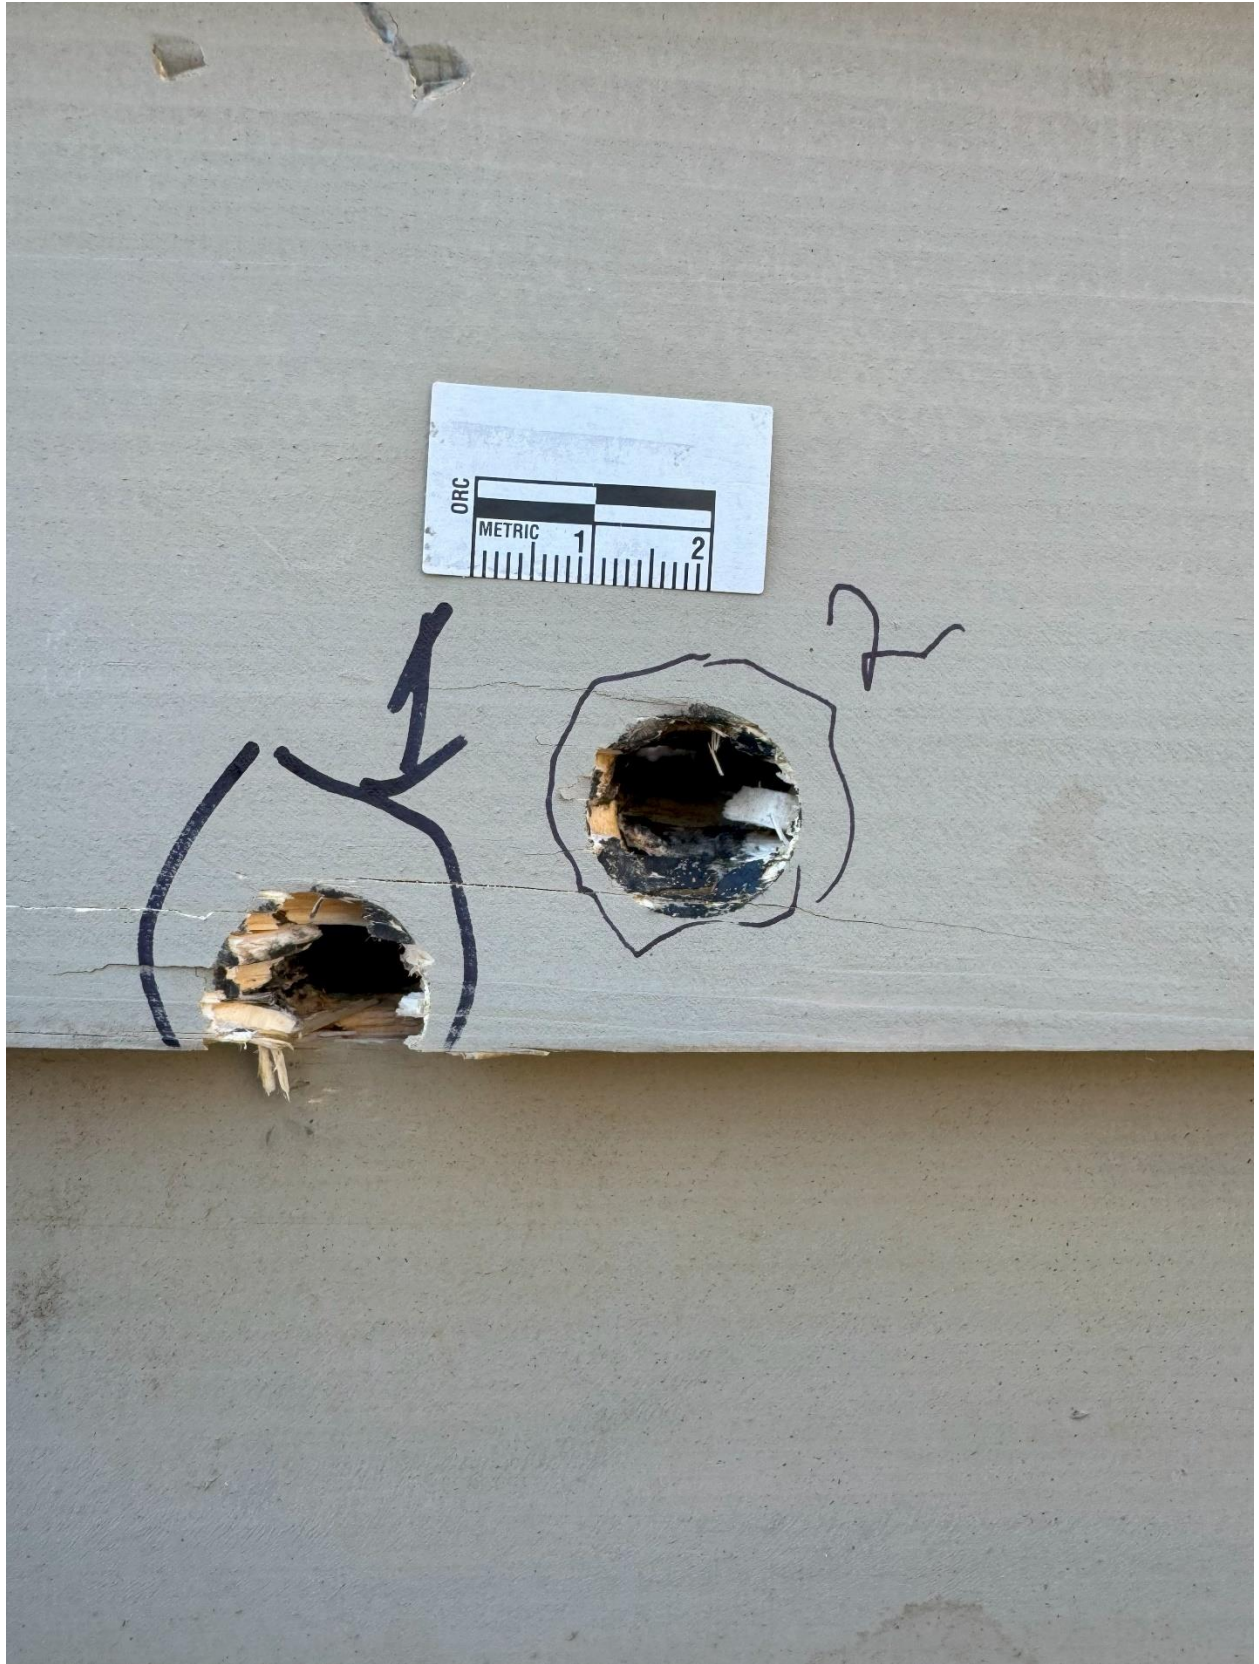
Wall 1, shots 1 and 2 entry holes in the clapboard siding.
